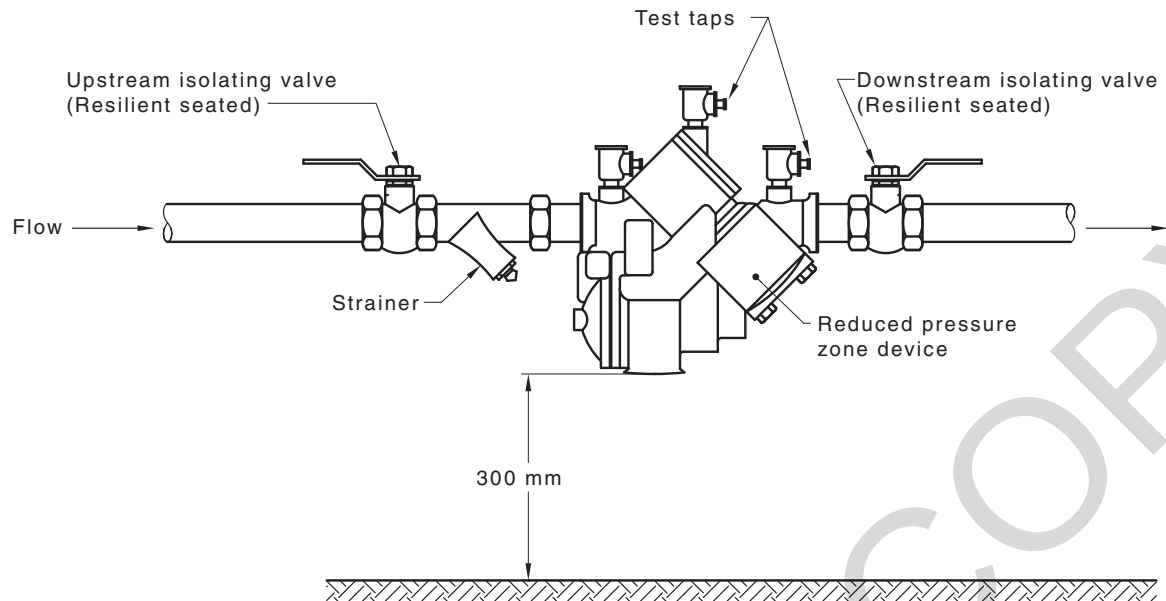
F7 TYPICAL INSTALLATION OF A REDUCED PRESSURE ZONE DEVICE
